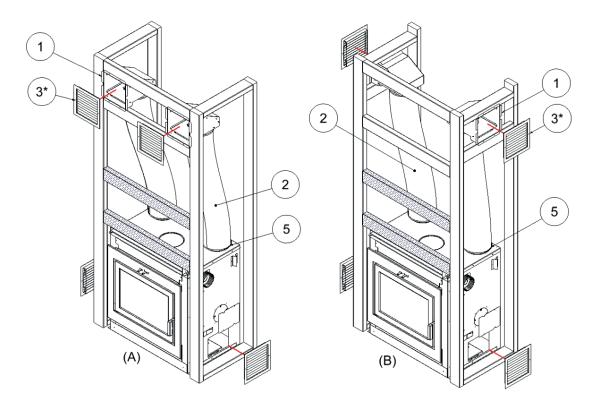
Elegance 30 6" Dual Gravity Duct Installation with Outtakes at (A) Front Wall and (B) Side Wall
